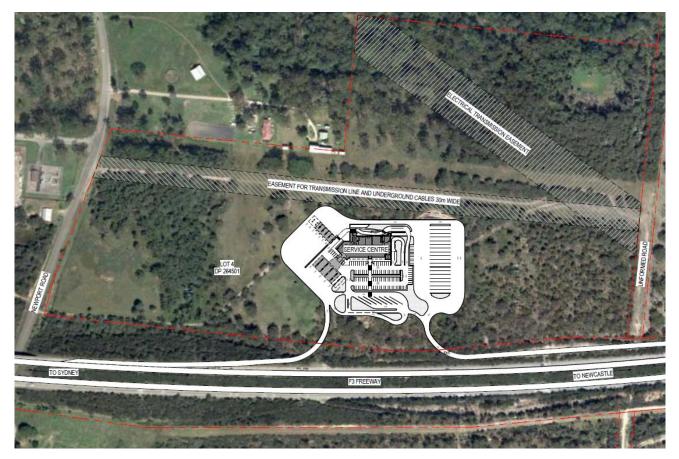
Concept Plan for Proposed Service Centre (source: Elton Consulting Planning Proposal May 2012)
